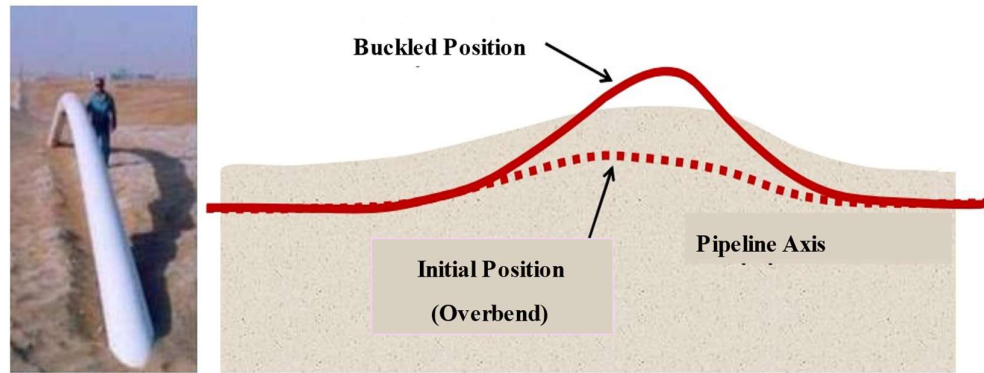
Beam buckling of buried pipeline due to excessive axial loading (after Karamanos et al., 2014)
